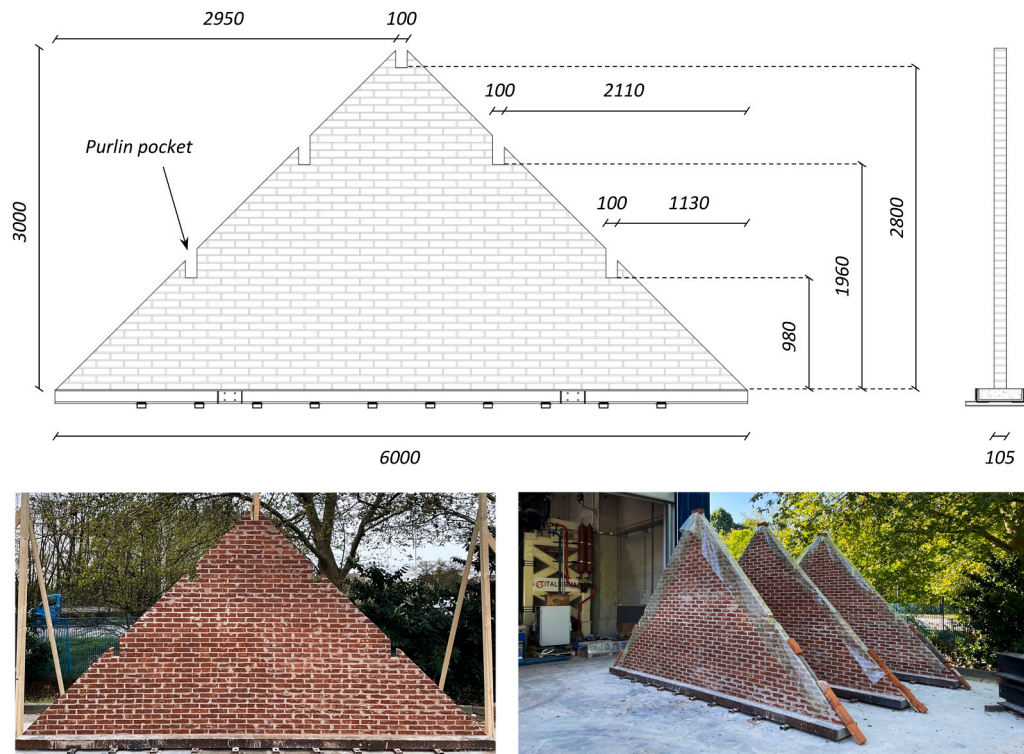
Full-scale masonry gable specimen details and pictures. Units of mm.
